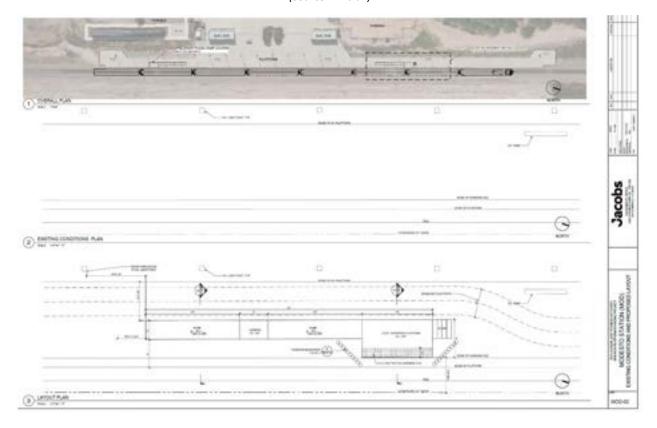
Modesto (Briggsmore) Station – Site Plan and Mini-high Layout Plan
